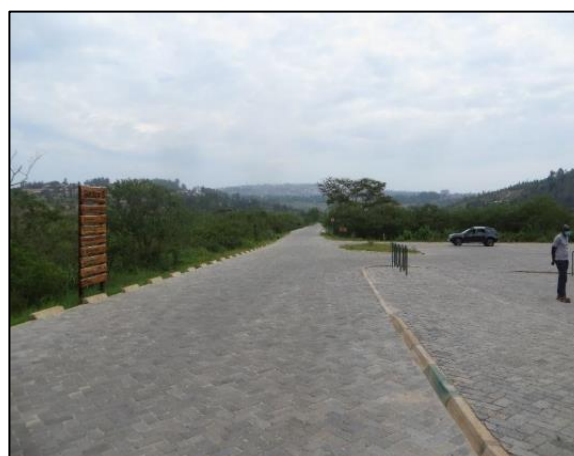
Parking lot off of the Kigali-Kayonza Road and near the information center located off of the Kigali-Kayonza Road.
